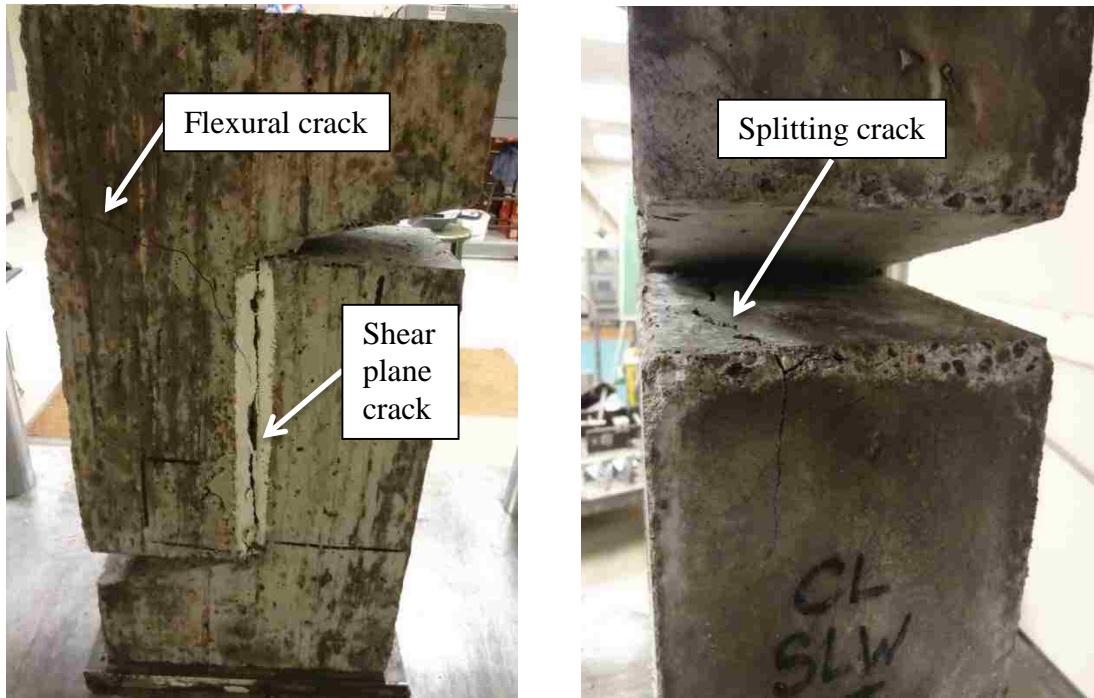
Typical cracking of specimens with lower reinforcement ratios; Specimens S-CL-CJ-R-13-2 (left) and S-CL-CJ-S-13-2 (right) shown
